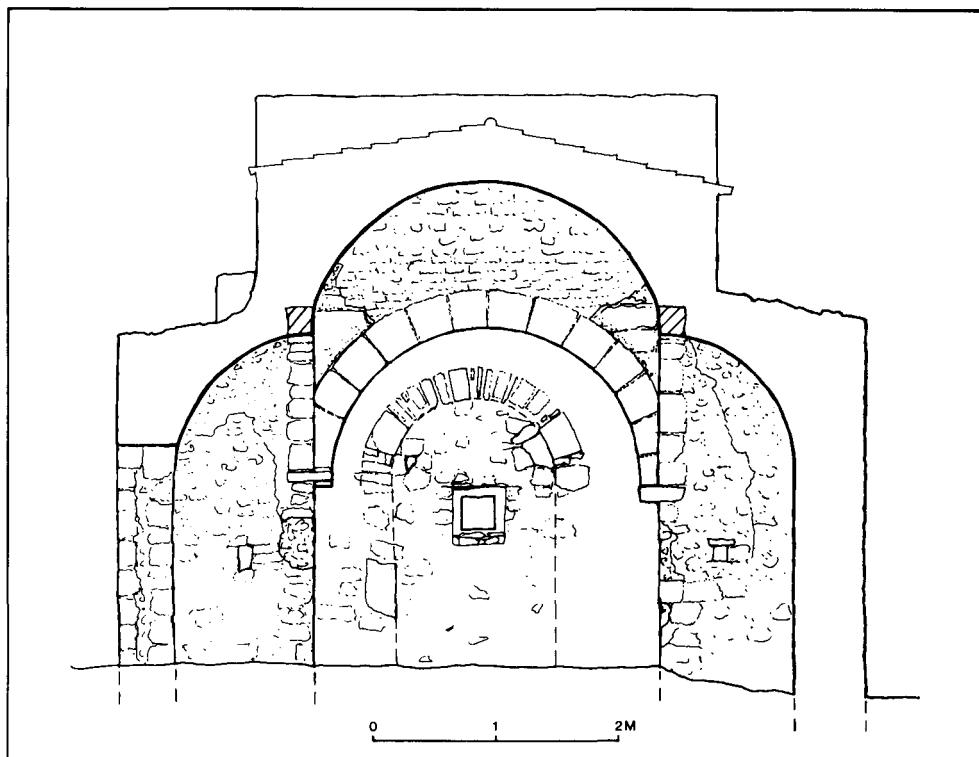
North-South section through the chapel looking west. (Drawn by Sheila Gibson)
